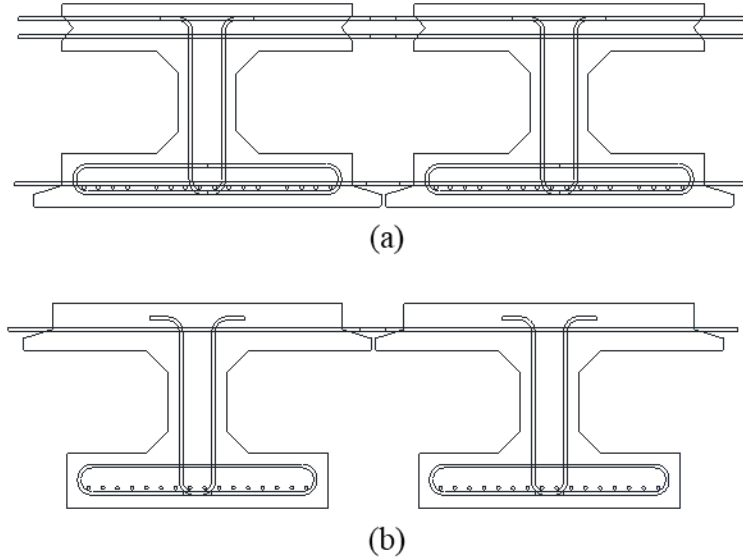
Modified slab beam with (a) bottom and top flanges connected and (b) only top flanges connected
